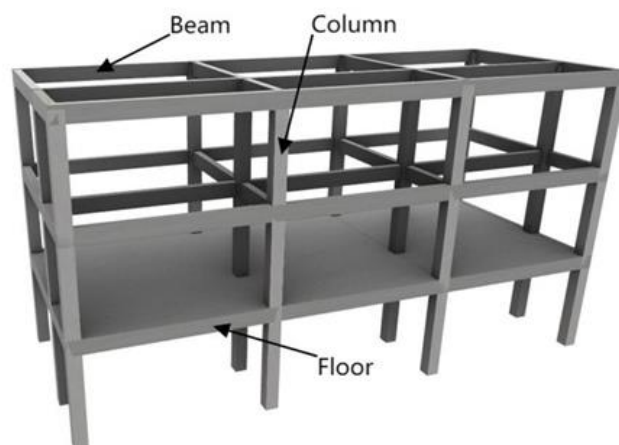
Spatial reinforced concrete frame of frame type building model
